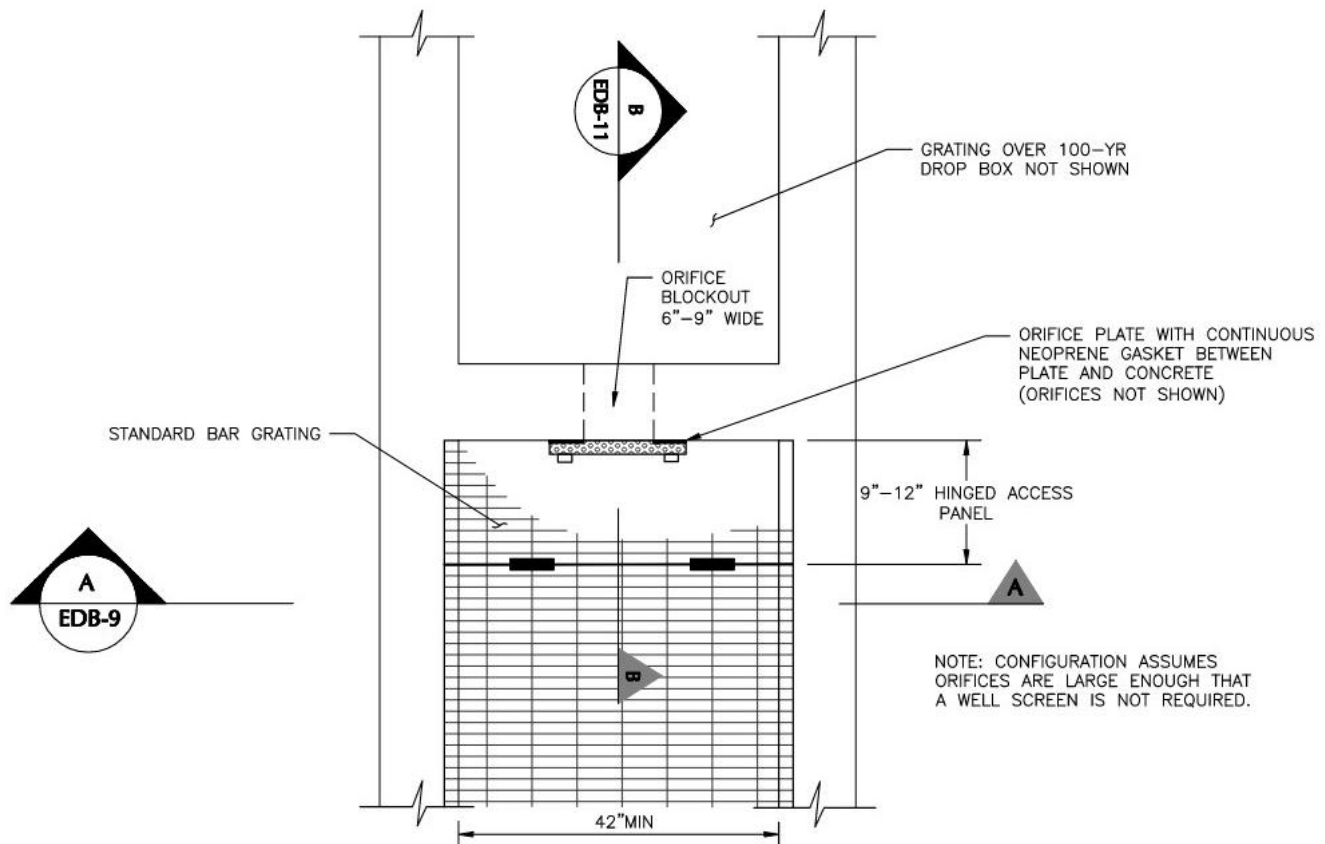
Conceptual plan view of orifice plates with standard bar grating plan view (not to scale)
